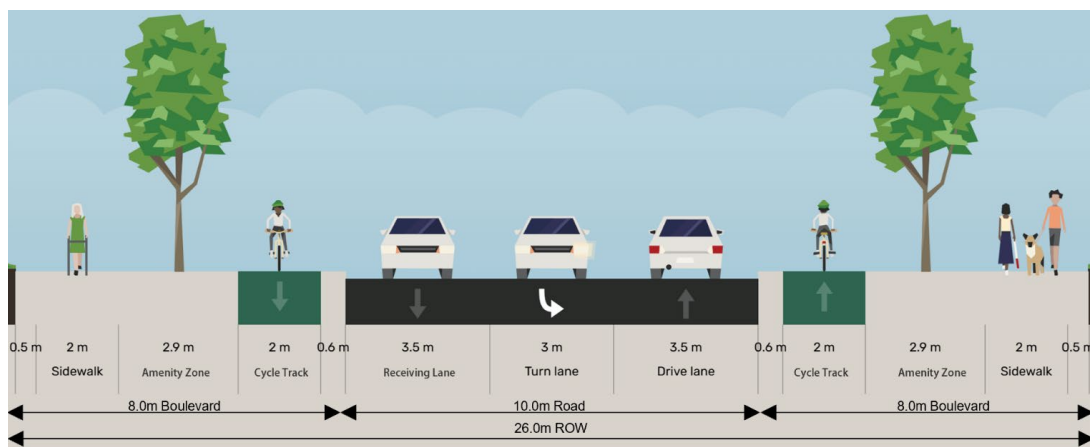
Minor Collector Cross Section with Parking on One Side – Intersection
